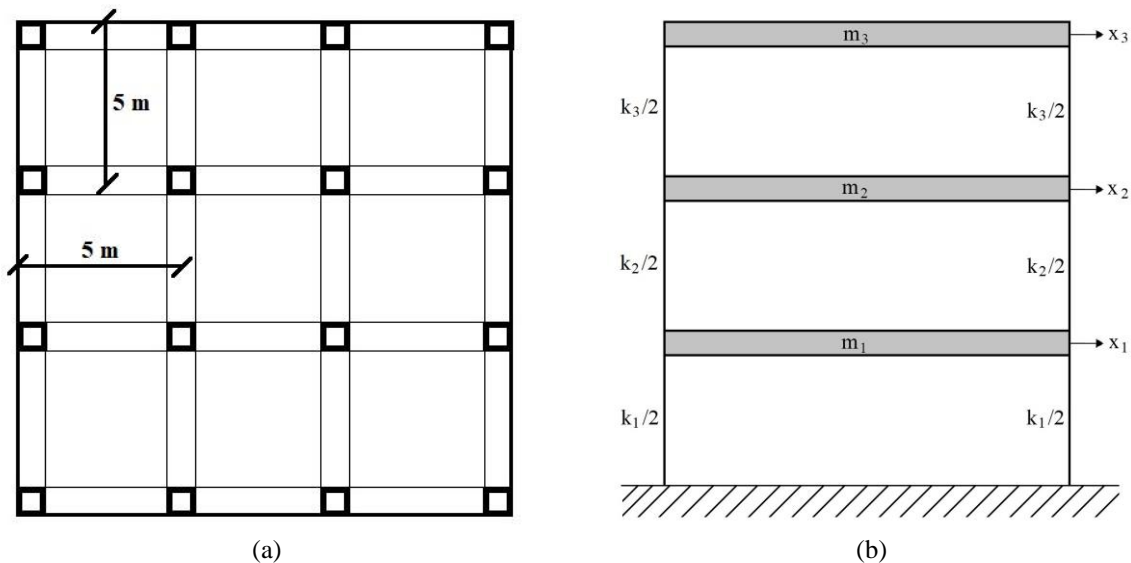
(a) Ground floor plan of a typical floor of the structure and (b) schematic presentation of a 3-DoF system mounted on a fixed base.
